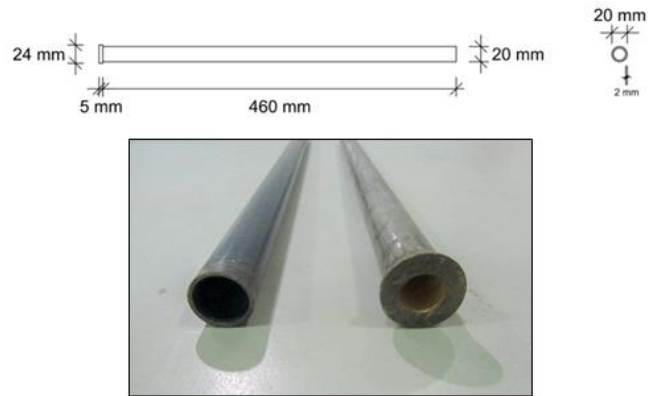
Detail of Model Pile and Fabricated Top Steel Plate
